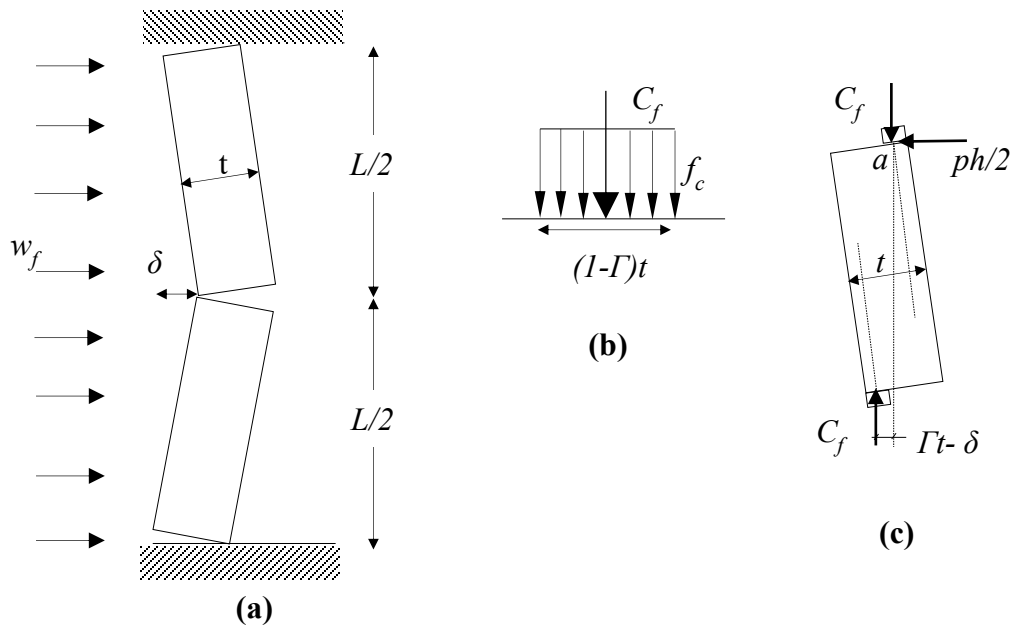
Three-hinged model for a deflected masonry wall: (a) wall subjected to out-of-plane pressure, (b) equivalent stress block of masonry, and (c) idealized wall segment model (based on Drysdale & Hamid 2005).
